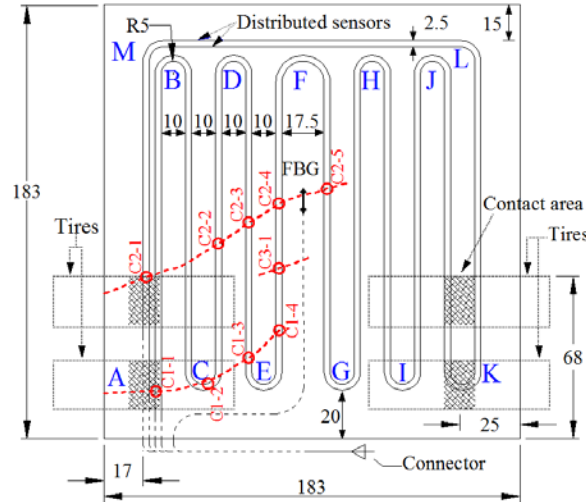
Sensor layout and three cracks in P3 under the fully loaded truck (unit: cm)
